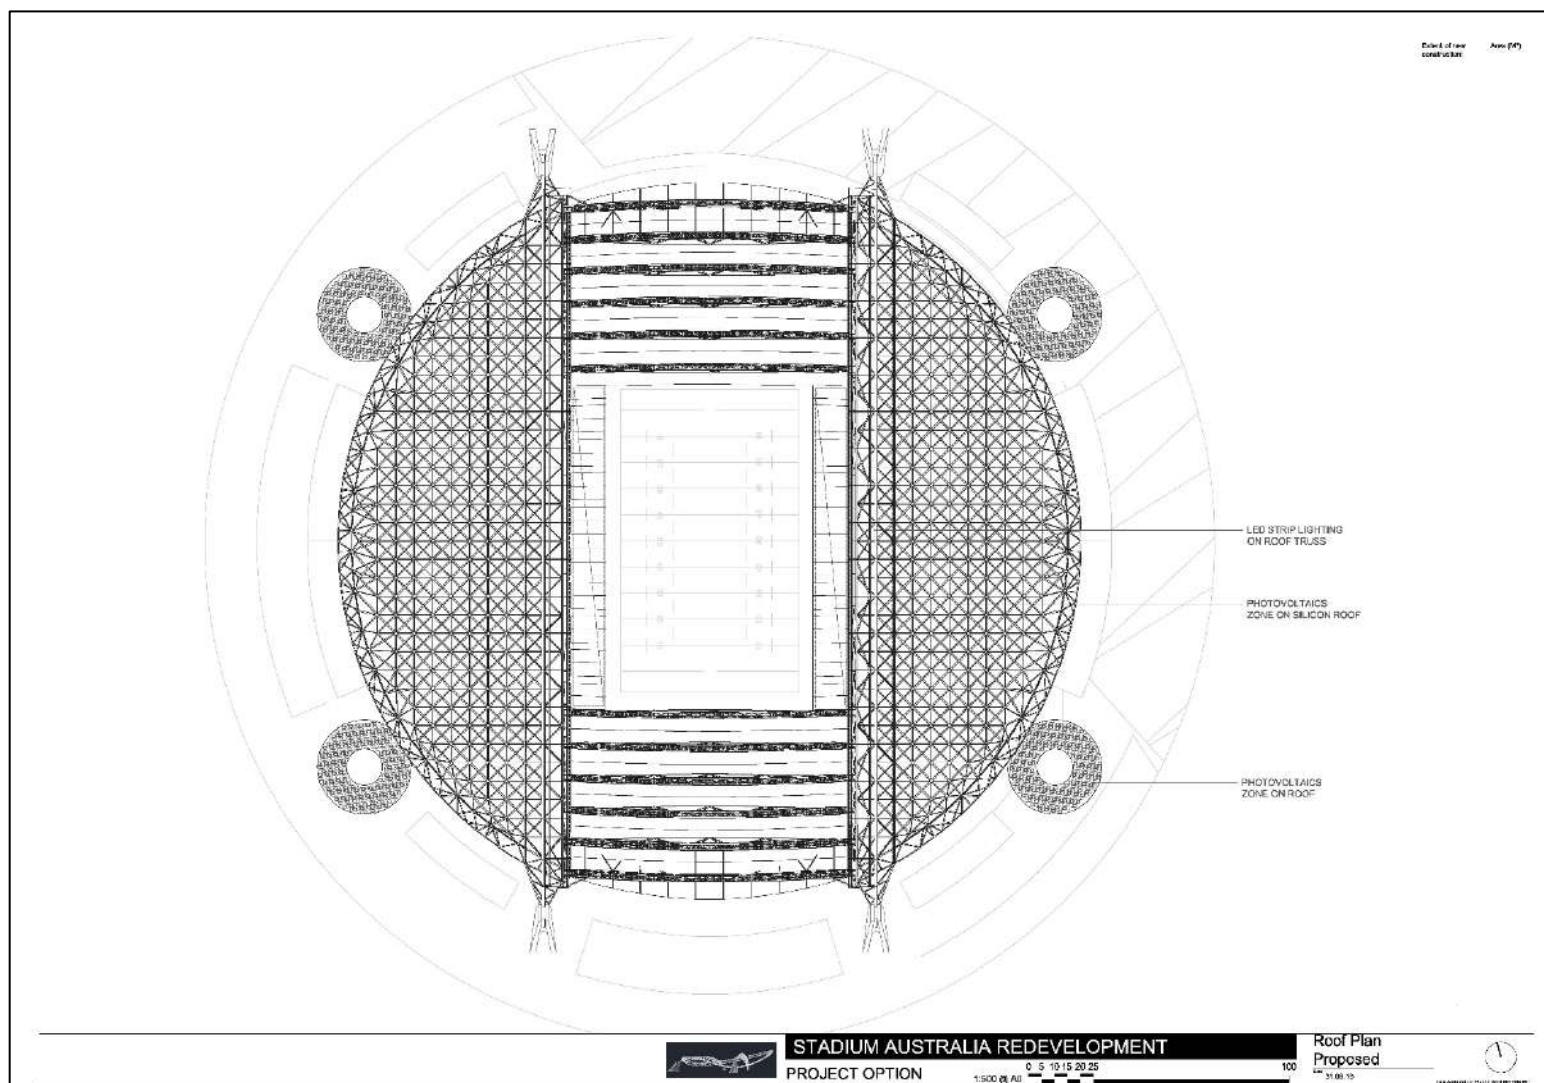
Proposed Roof Plan (Source: Cox, 2019)
